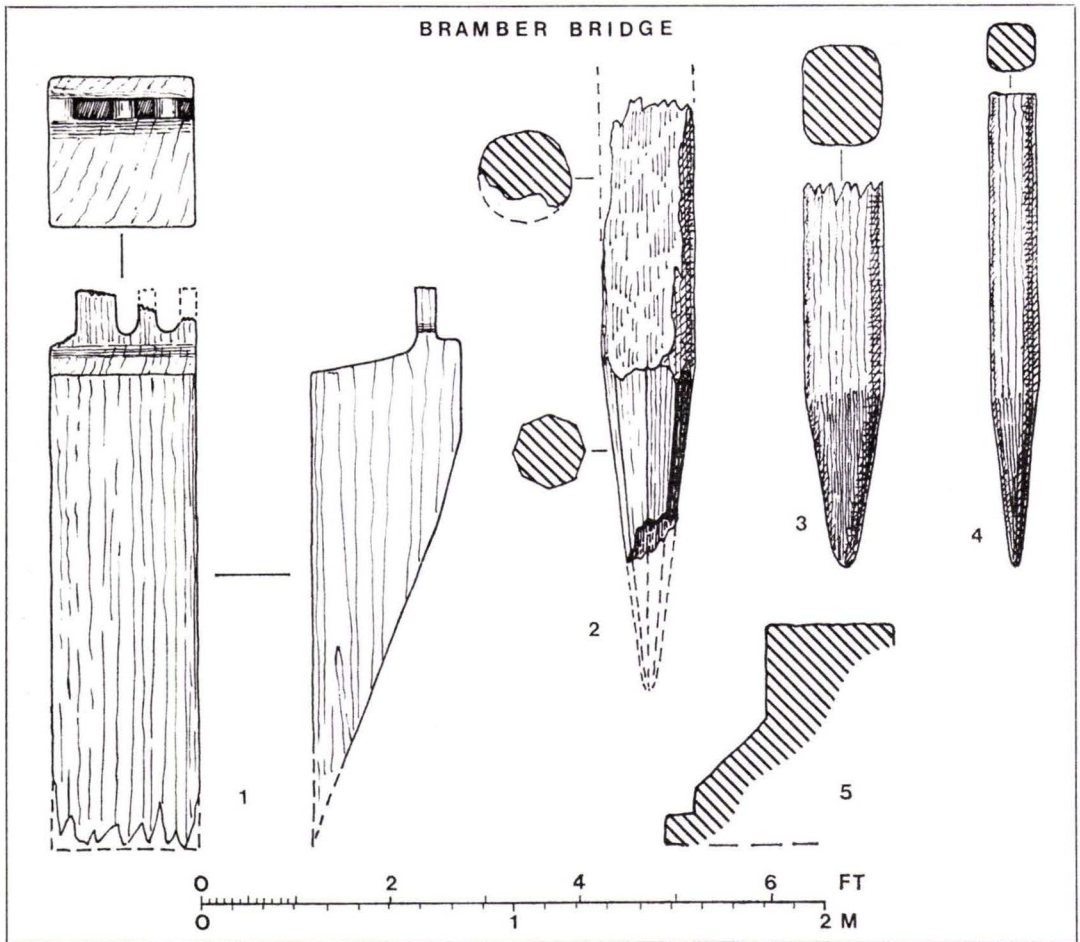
1-4: Details of wooden piles. 5: Section through Sussex marble bridge pier foundation
